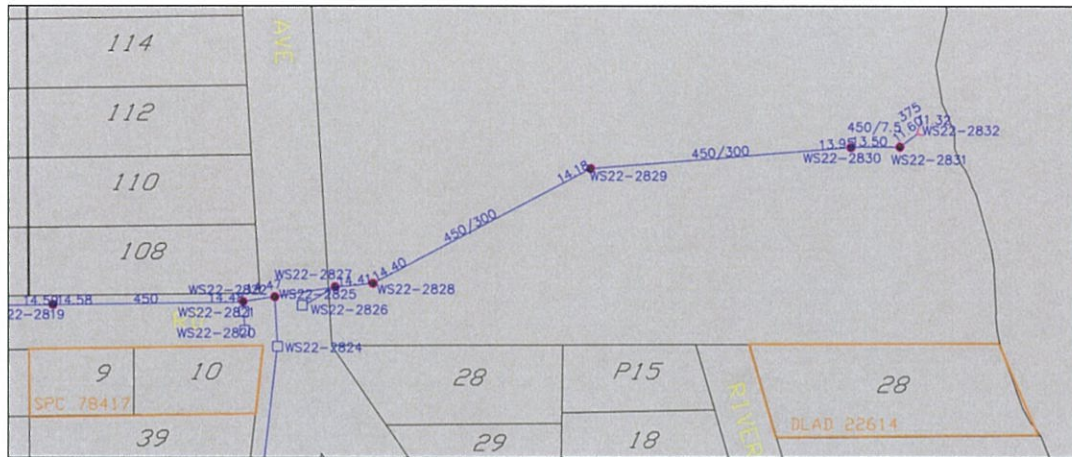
DRAINS section showing the stormwater pipe which discharges to the Spillway
